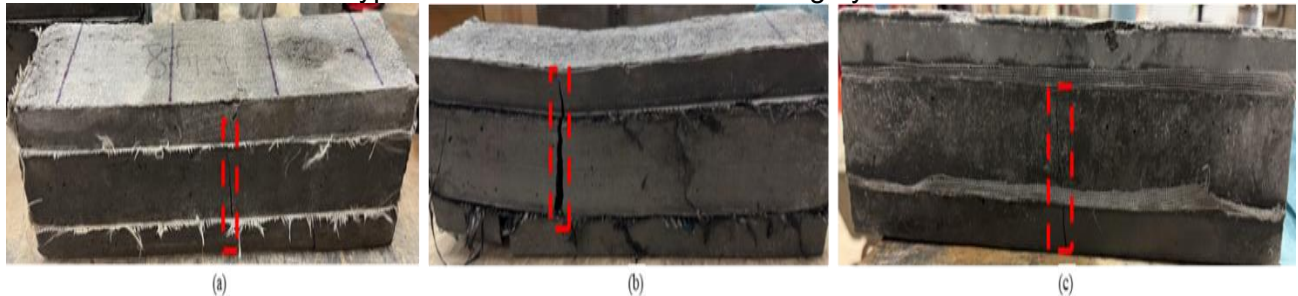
(a) 0-day exposed GFRP beam after failure (b) 0-day exposed CFRP beam after failure (c) 0-day exposed Steel beam after failure
